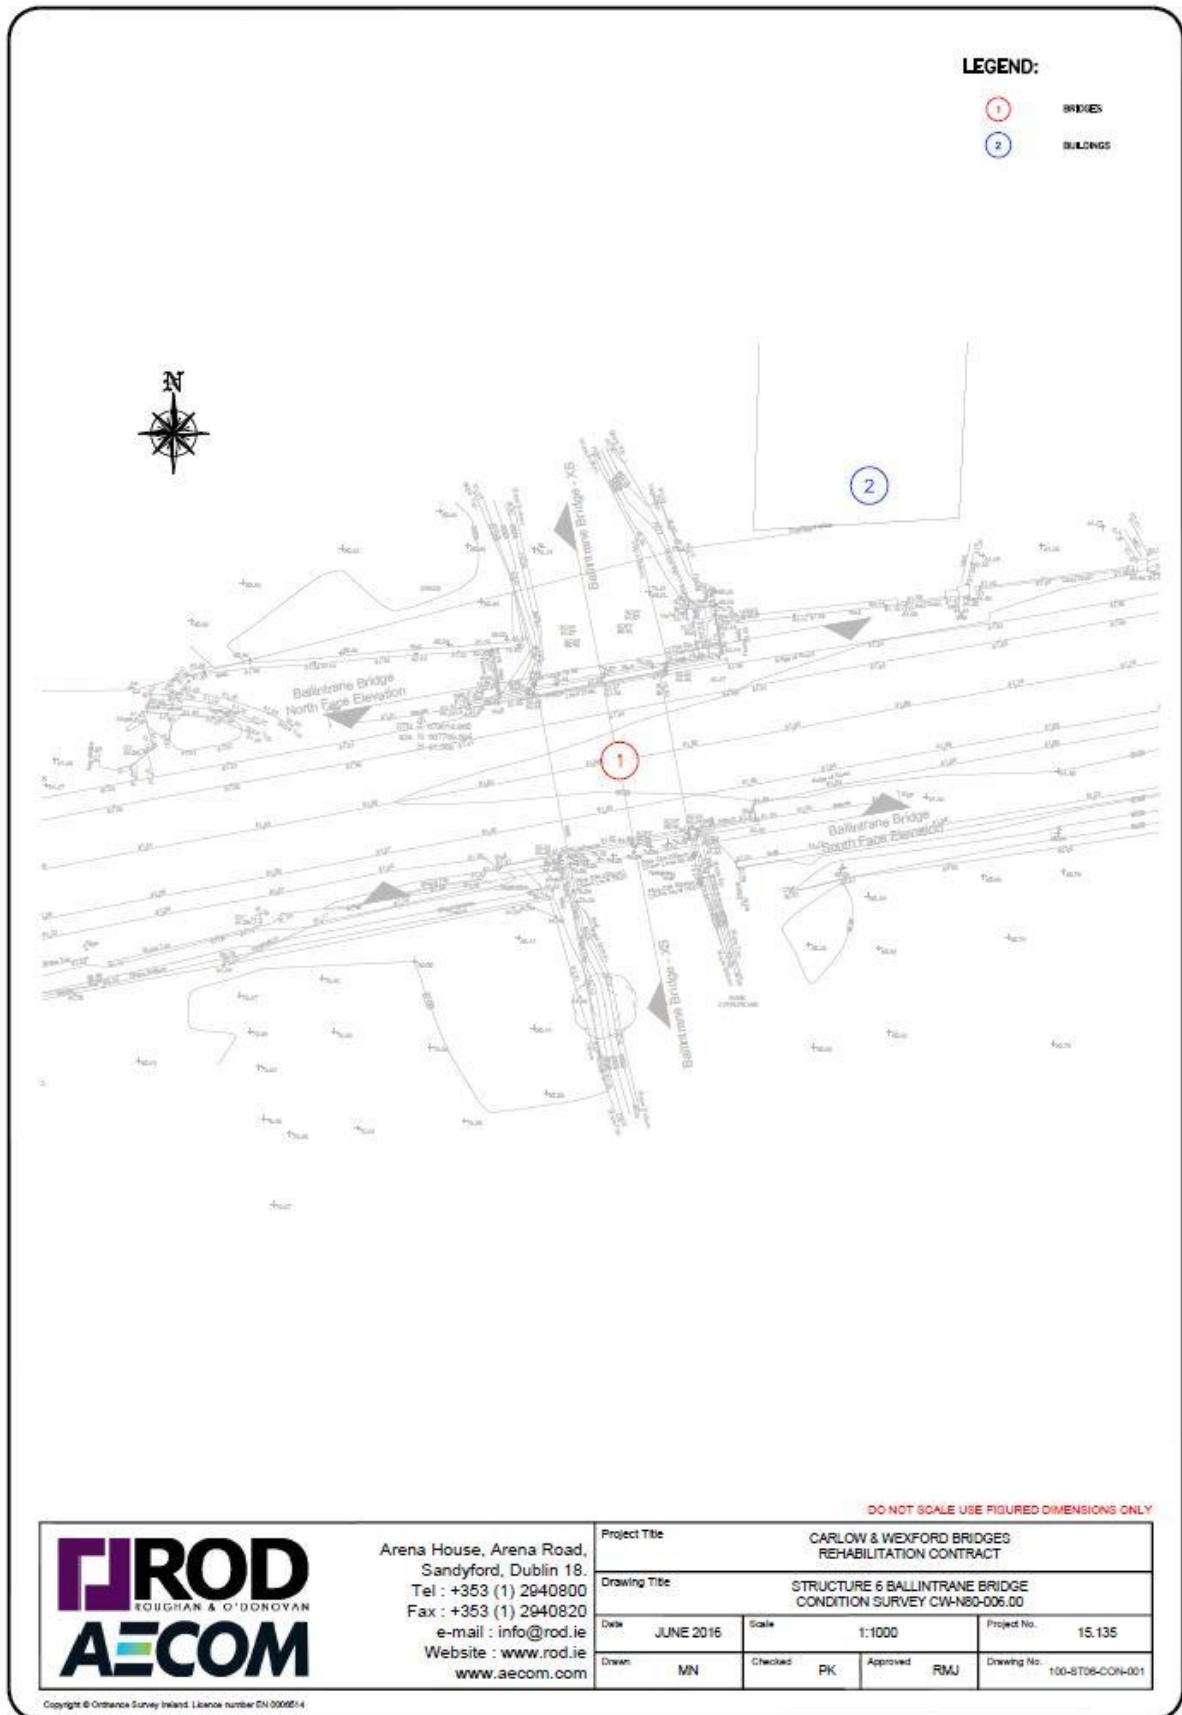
/73/6 Str06 Ballinrane Bridge CW-N80-006.00
